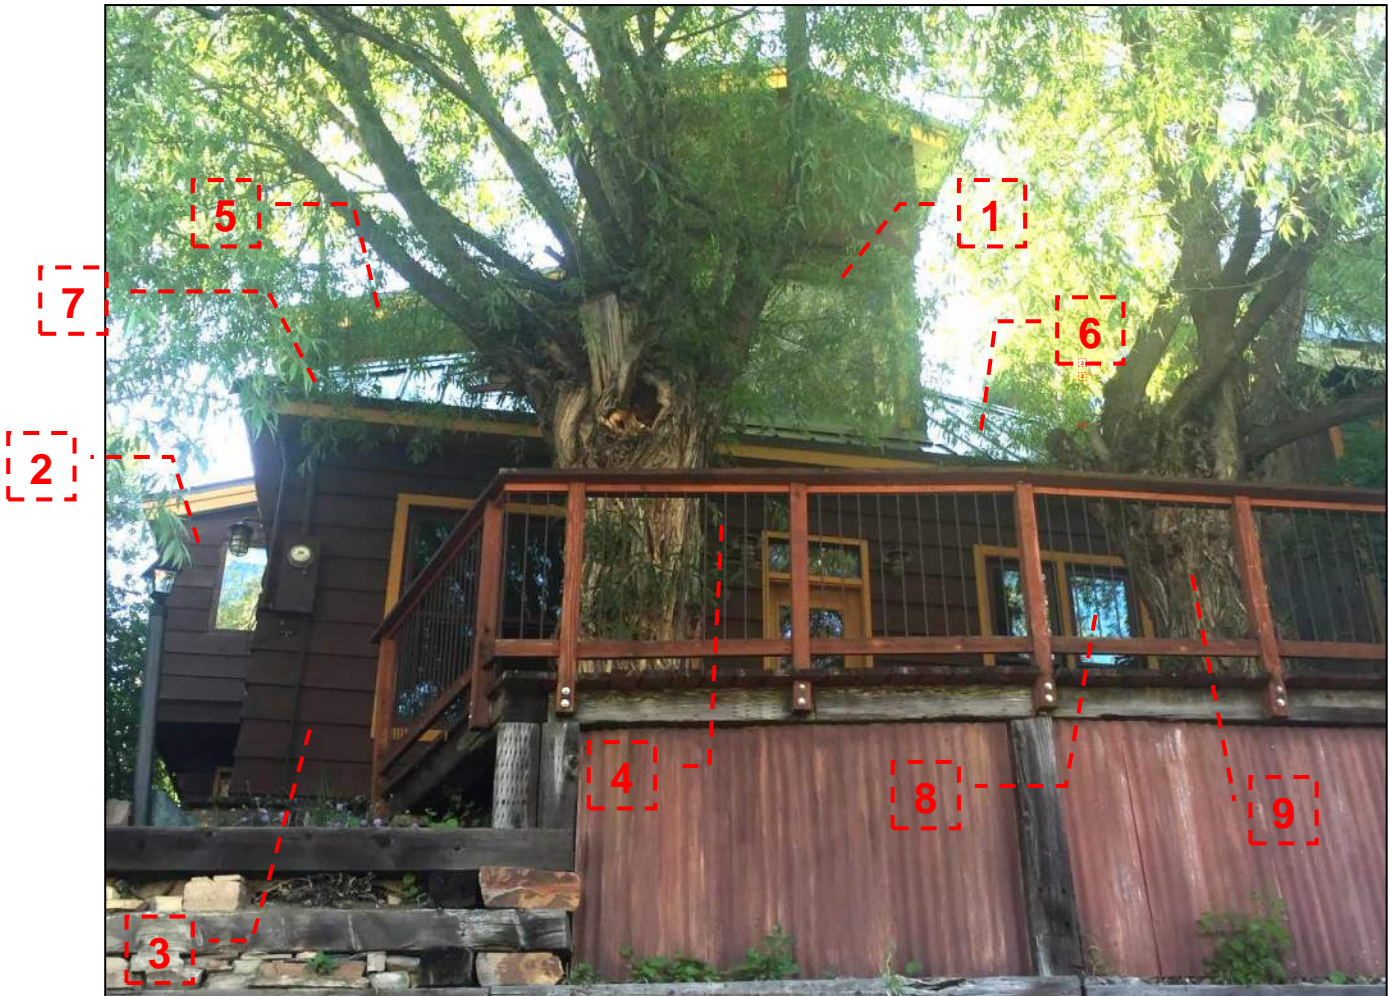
416 Ontario Avenue, 2016. Camera facing southeast.
